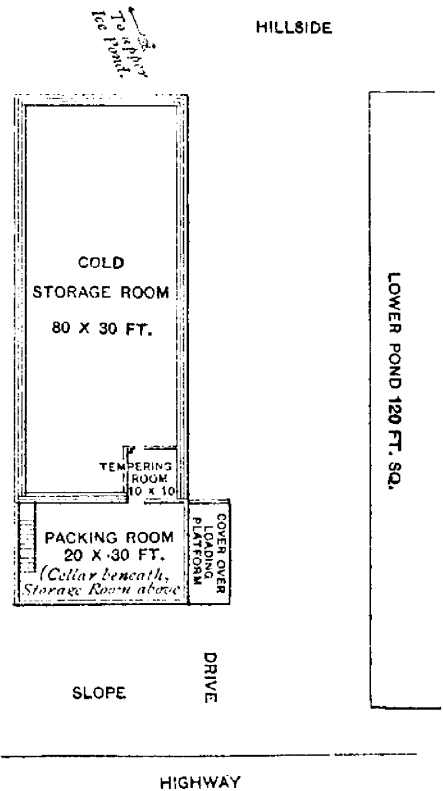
GROUND PLAN OF HOUSE, WITH SURROUNDINGS.
